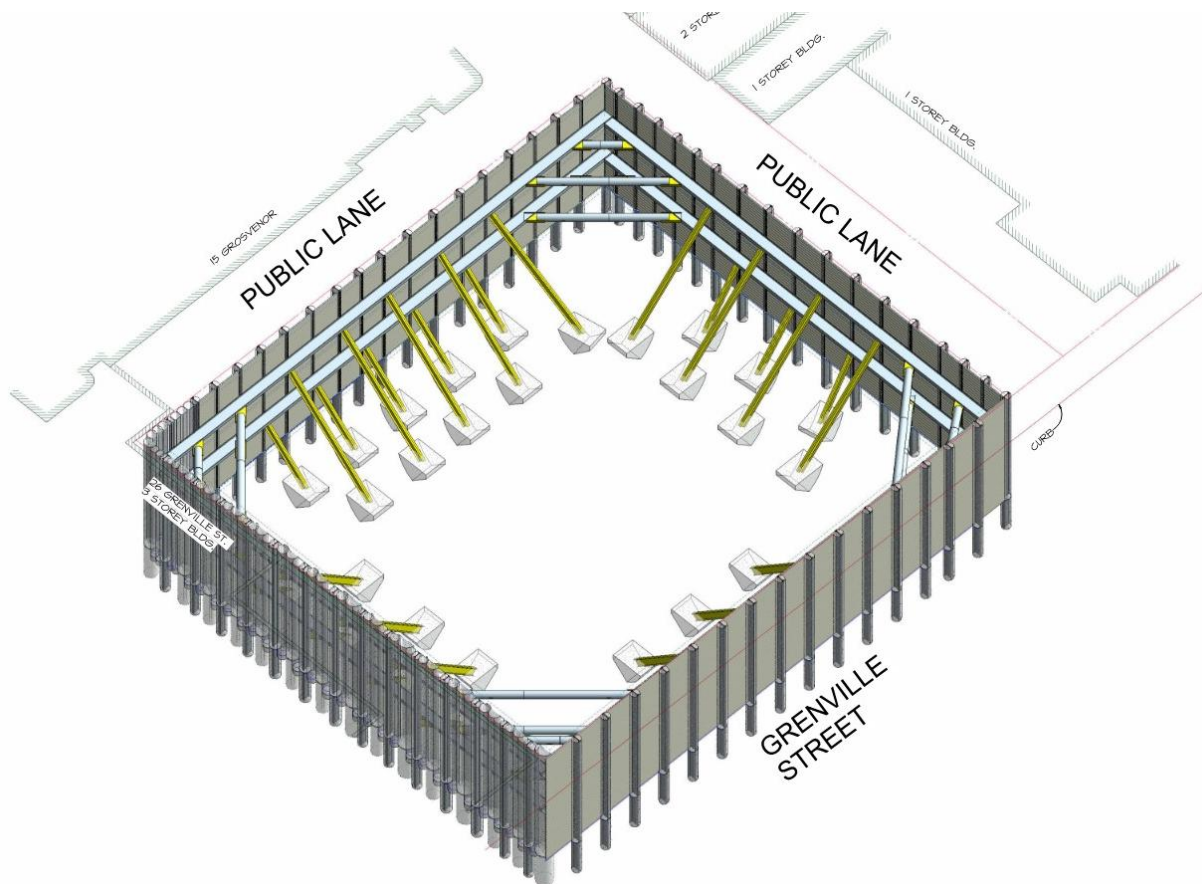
Internally supported excavation using steel “raked” and corner braces.
